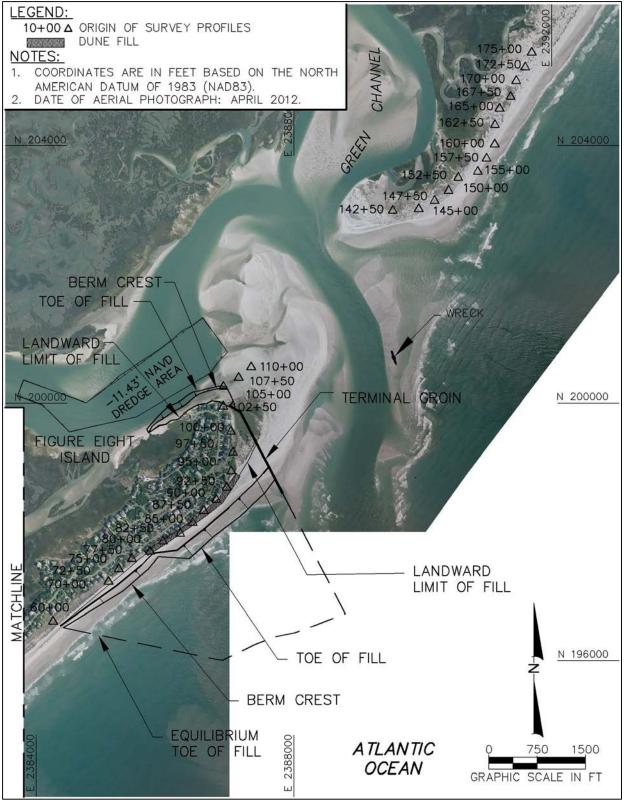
Plan View of Alternative 5B; 2012 shoreline conditions.
